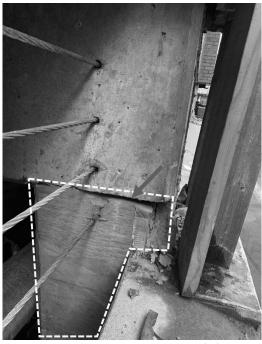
Previous concrete repair at Column 11A below beam at the north face of the column. 4-inch deep cold joint between the concrete repair and the bottom face of the column indicated with red arrow.
